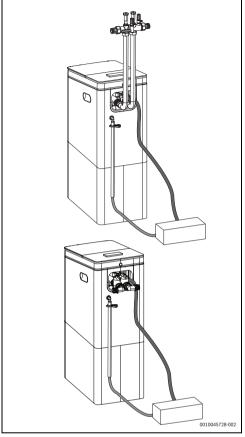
Overview of the overflow elbow pipe and waste pipe after installation
